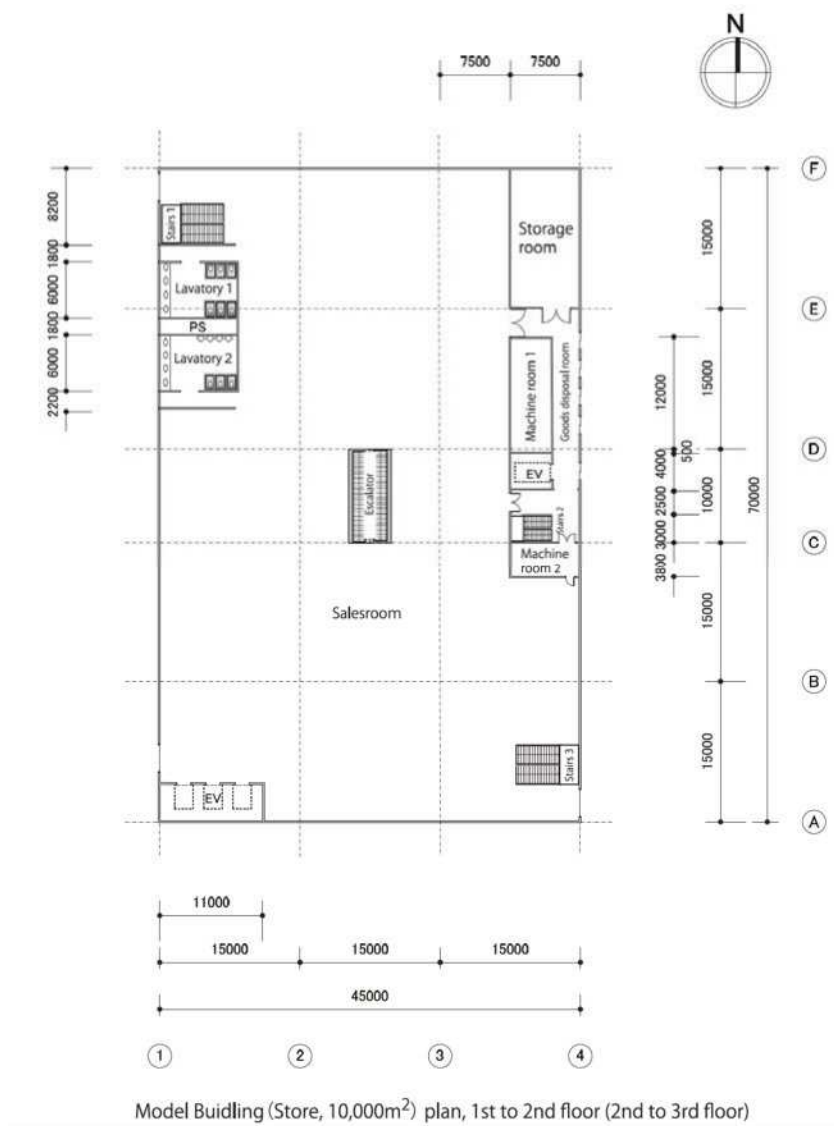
Model building (store, 10 000 m²) plan, 1st to 2nd floor (2nd to 3rd floor)
